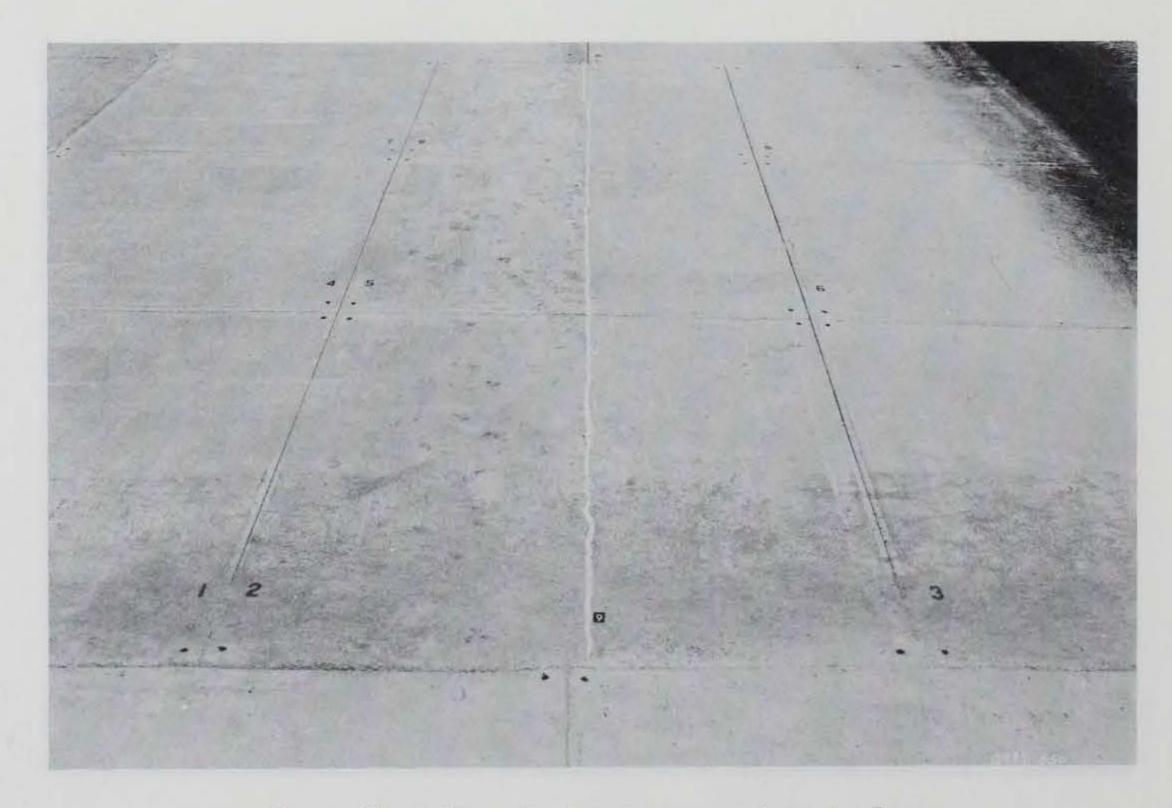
Item 9 showing a weakened plane progression crack from item 10
